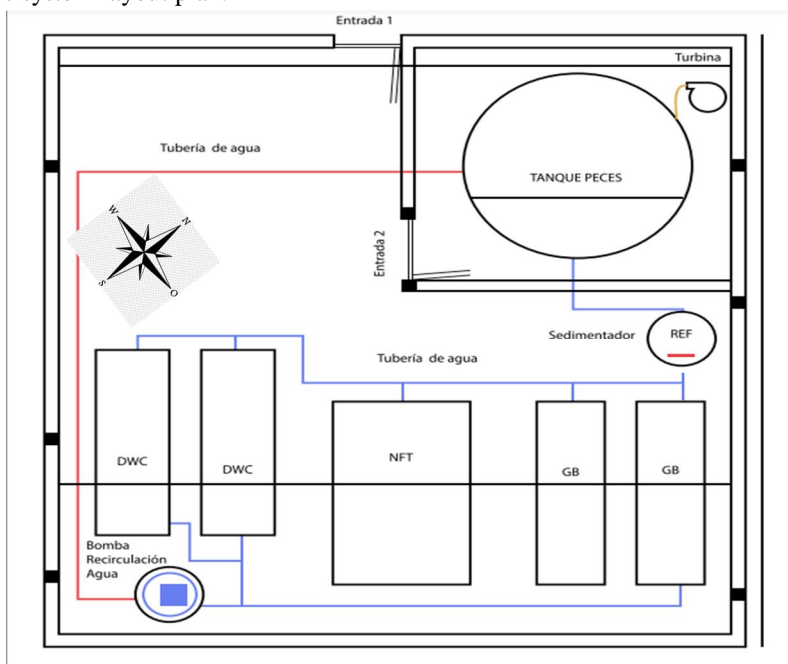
Initial layout plans of the aquaponic greenhouse, Los Robles campus.
